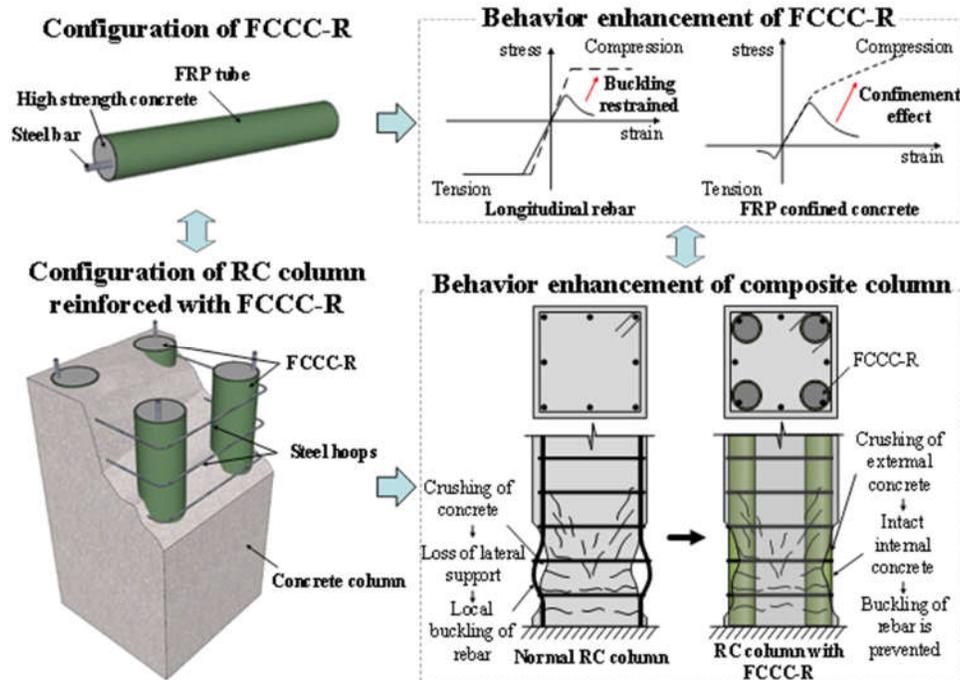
Configuration and mechanism of FCCC-R and corresponding composite column
